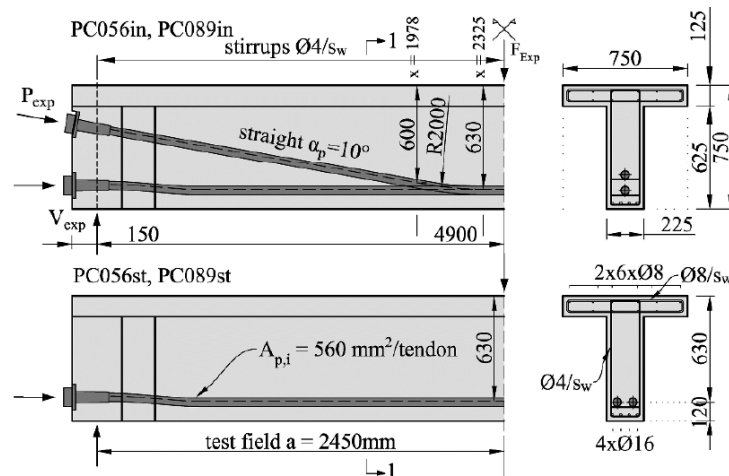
Dimensions of the test specimen, reinforcement and tendon layout [Huber et al., 2017].
